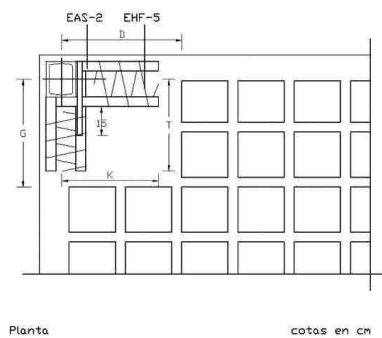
Corner steel pier anchorage. In NTE (Normas Tecnológicas de la Edificación).
